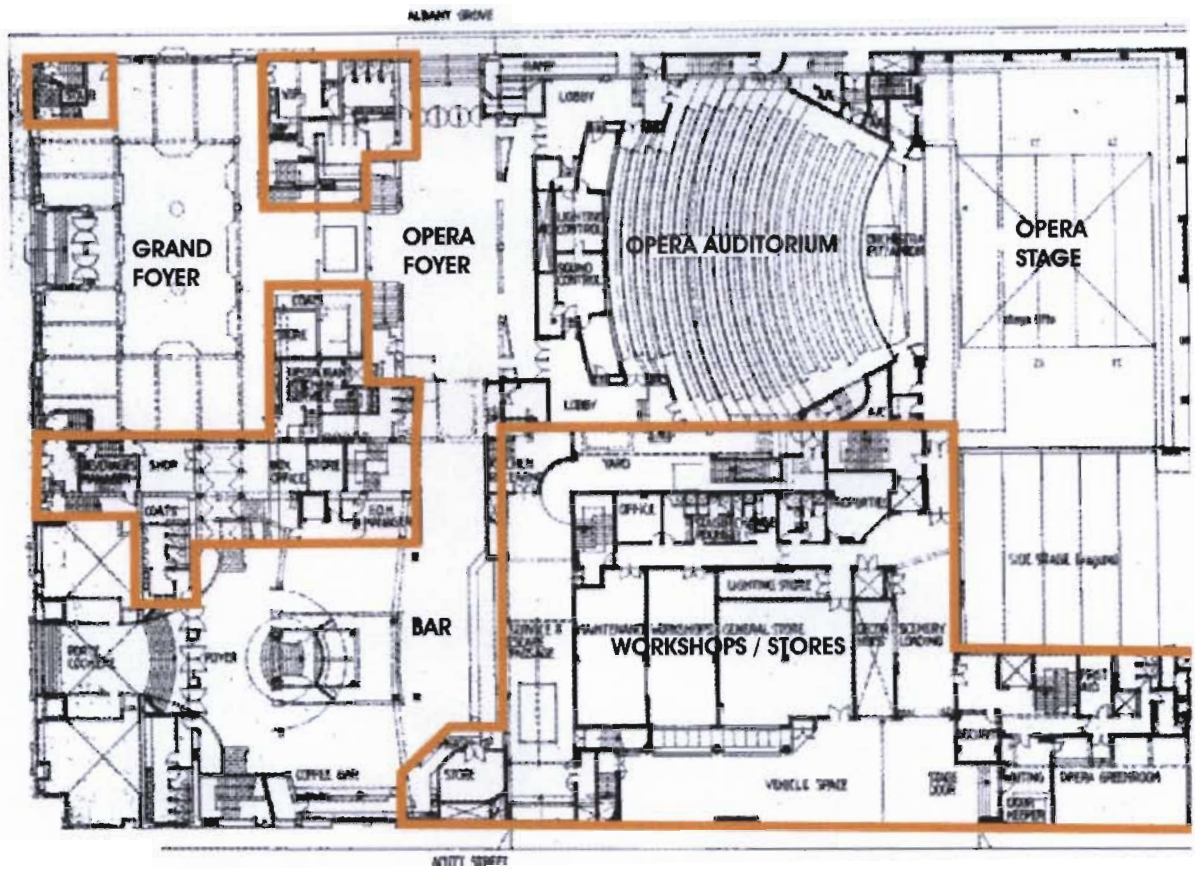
Playhouse Ground Floor Plan (Peters, 1983)
